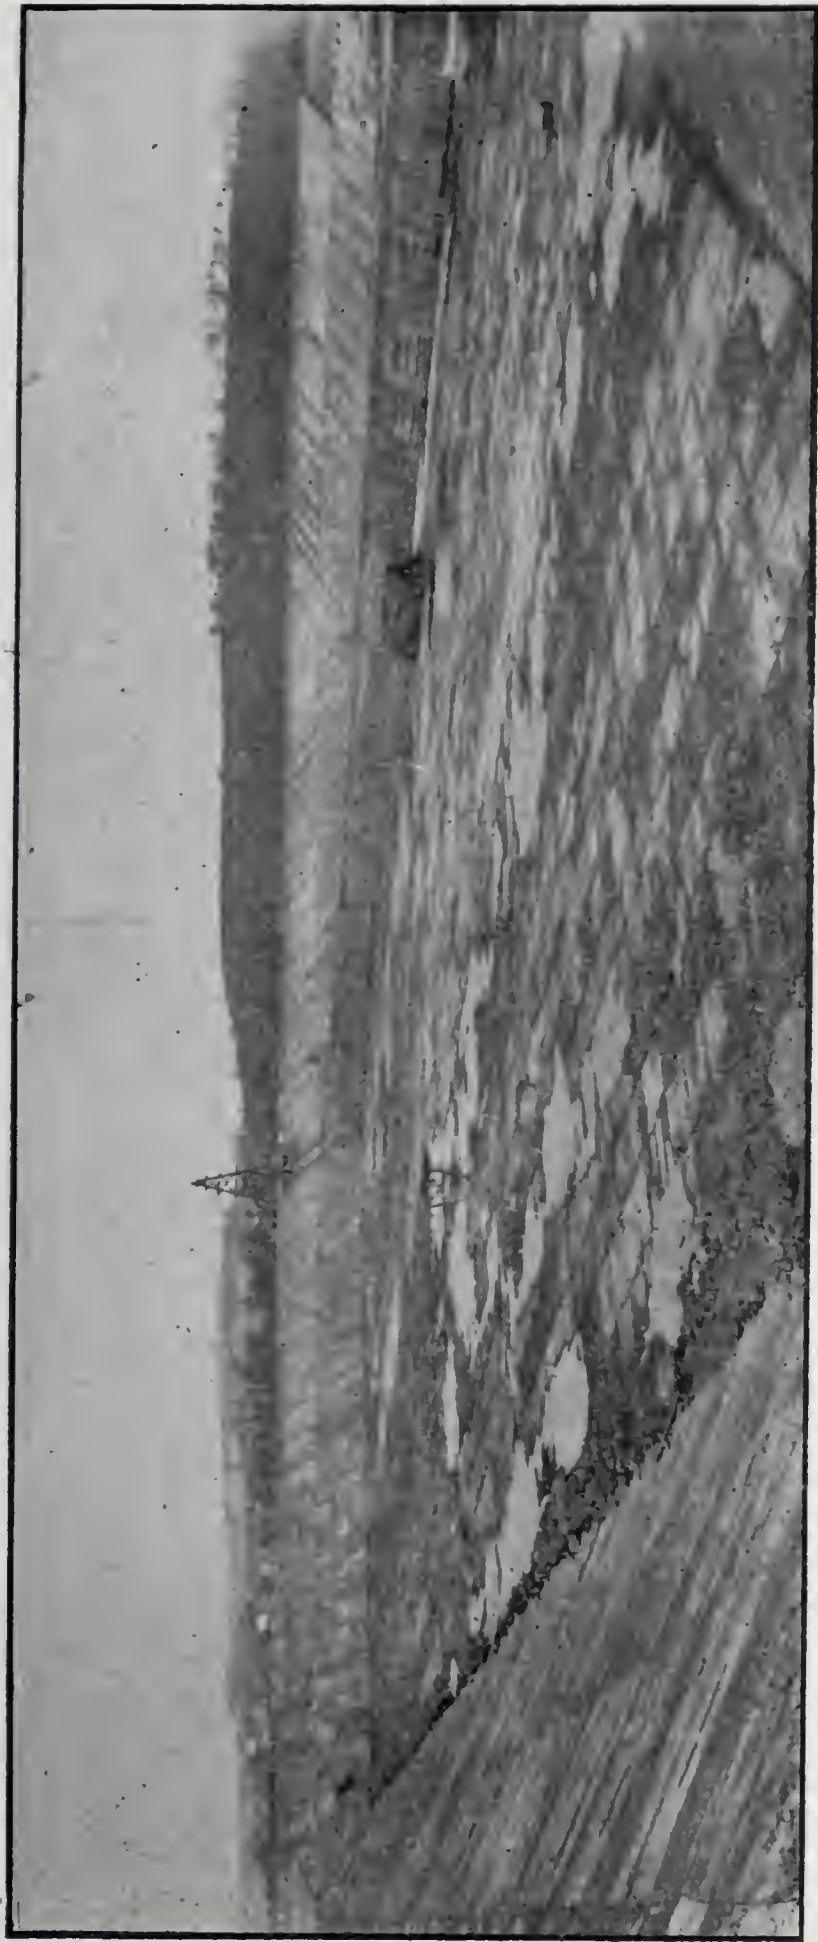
North Side Reservoir; Looking Northeast, Showing Concrete all Placed.
